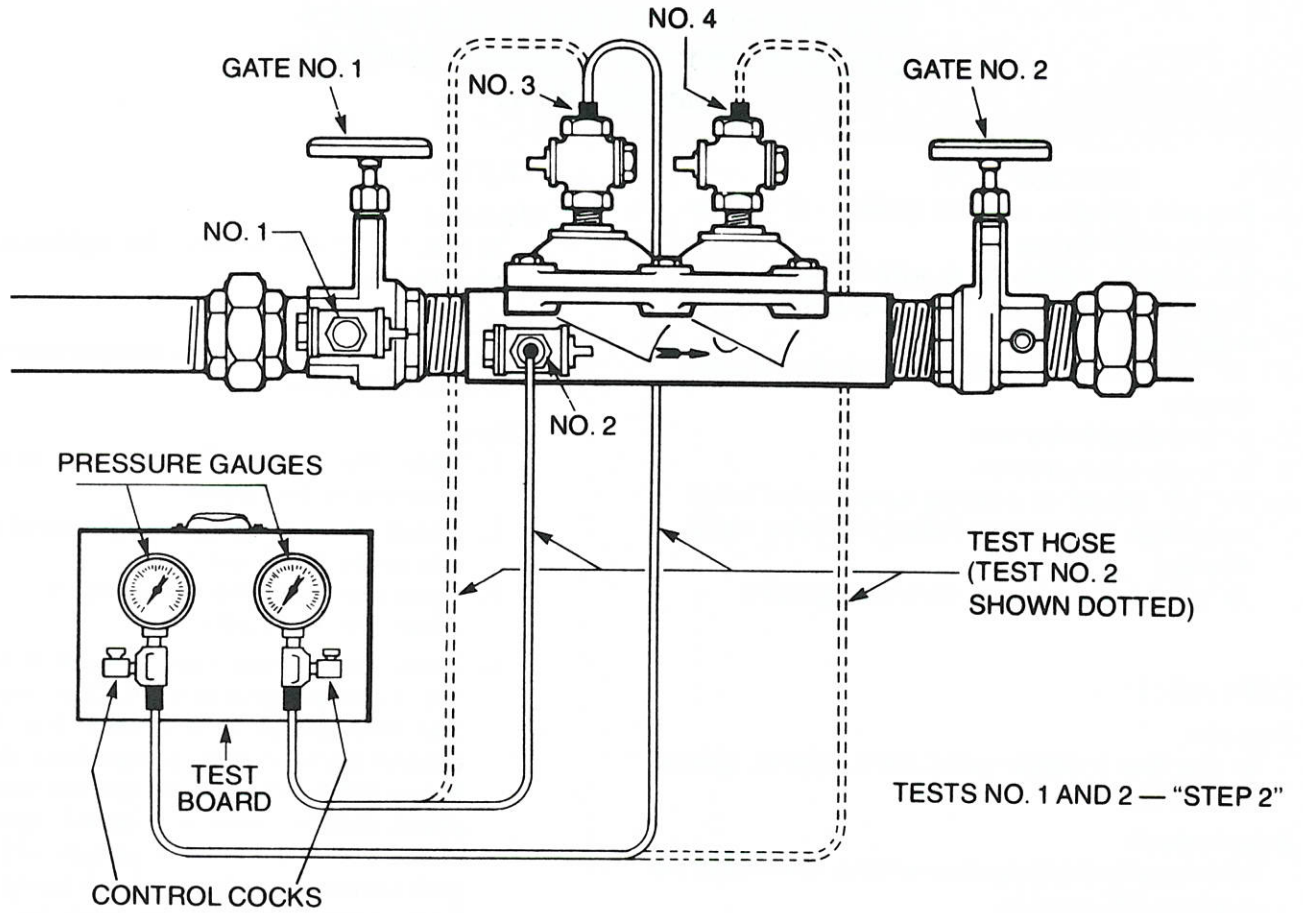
PRESSURE GAUGES INSTALLED ON FDC DOUBLE CHECK VALVE ASSEMBLY
